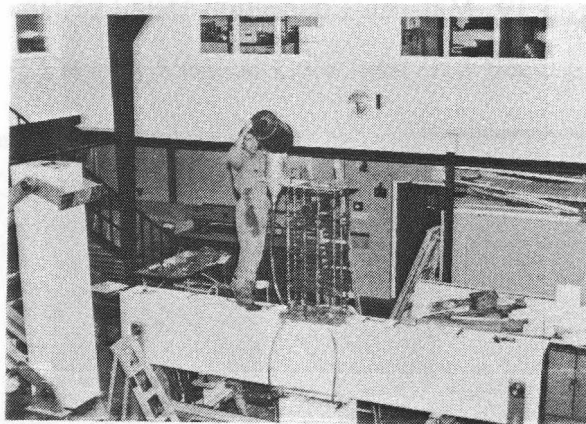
Grout Being Fed Through Corrugated Ducts in Unit 6.
